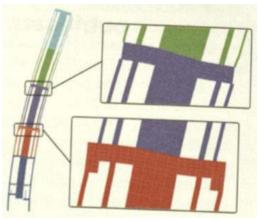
Core-Outrigger Diagram of the Trump Tower
